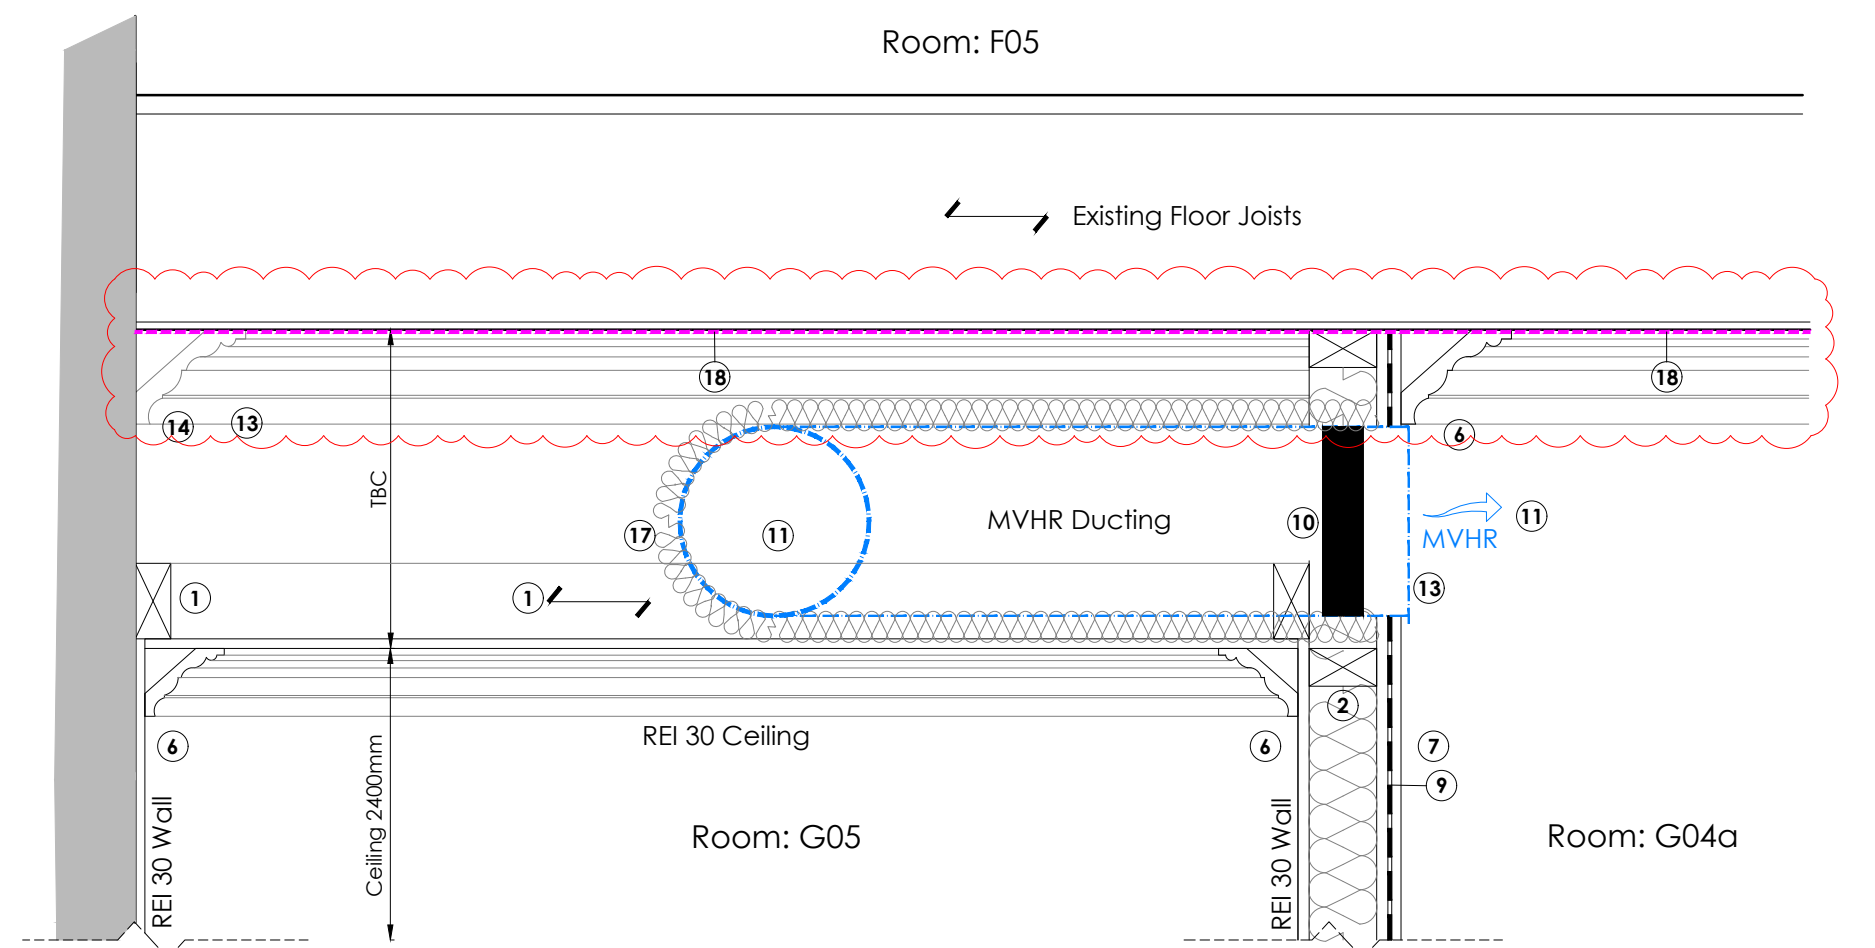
New Lobby Floor and Internal Walls - scale 1:10
